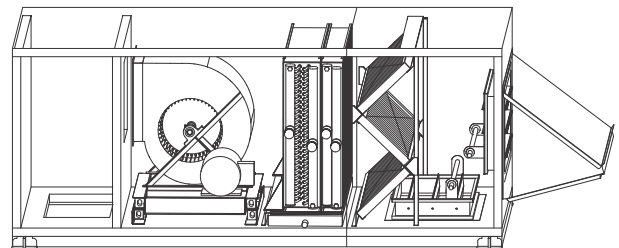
shows the draw-thru arrangement in the mixing box/filter section.
